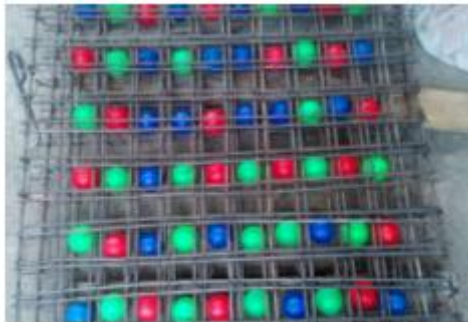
Reinforcement of Alternative bubble deck slab (type II)
